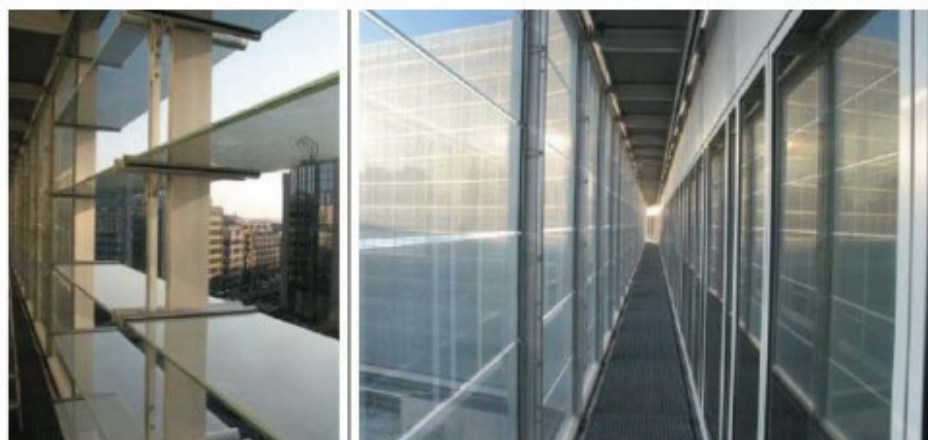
The Berlaymont Building in Brussels, Belgium, with moveable glass louvers as the outside facade layer (Source:Beckers,2000).
